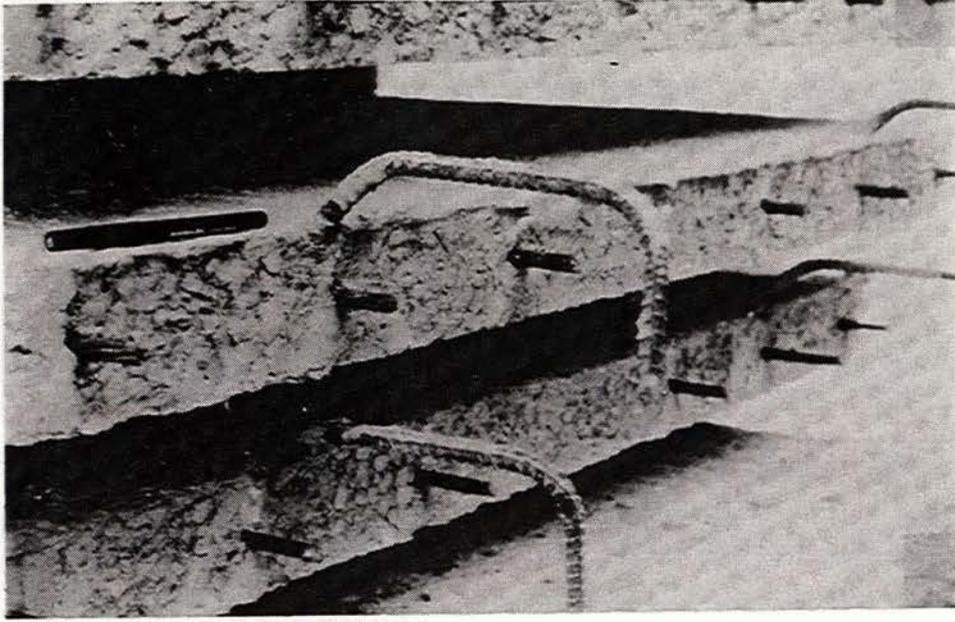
Hanger Bars for Precast Concrete Floor Units According to the New Zealand Guidelines [1]
